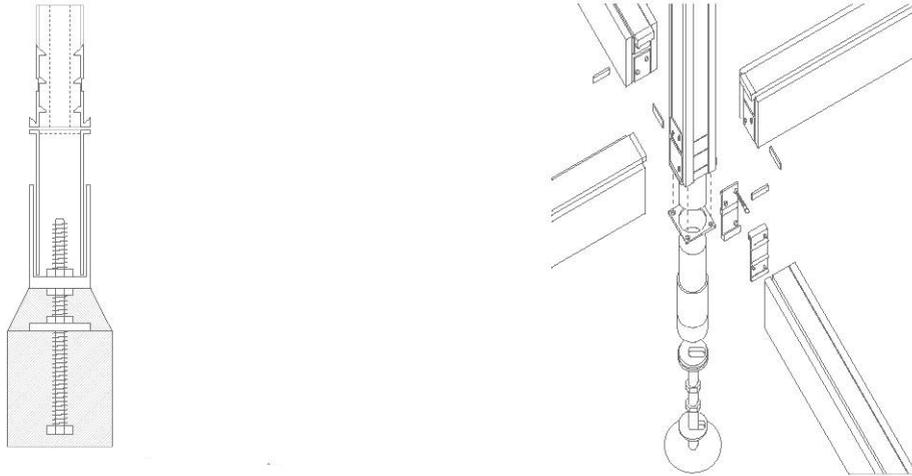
Connection to foundation (Rista et al., n.d.)
